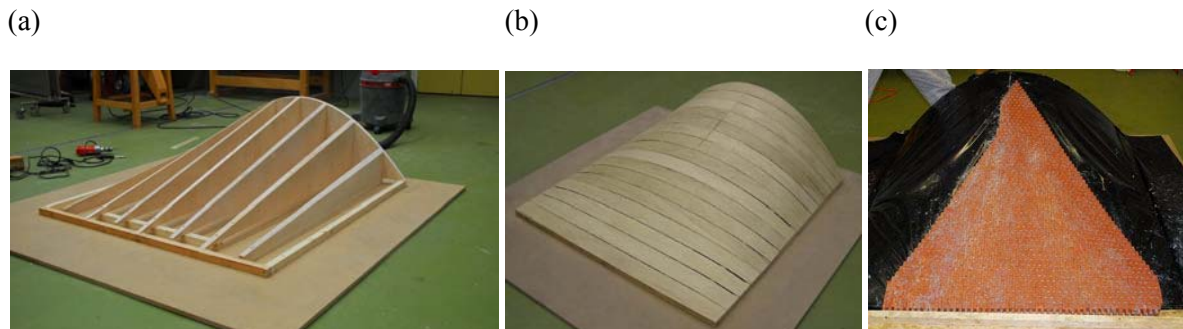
Shell Construction: (a) Scaffolding; (b) Plywood Boards; (c) First Construction Stage
